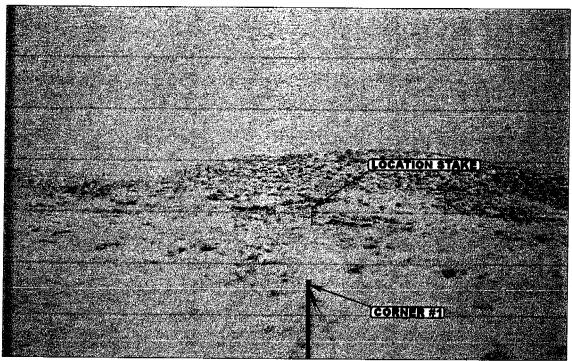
PHOTO: VIEW FROM CORNER #1 TO LOCATION STAKE
